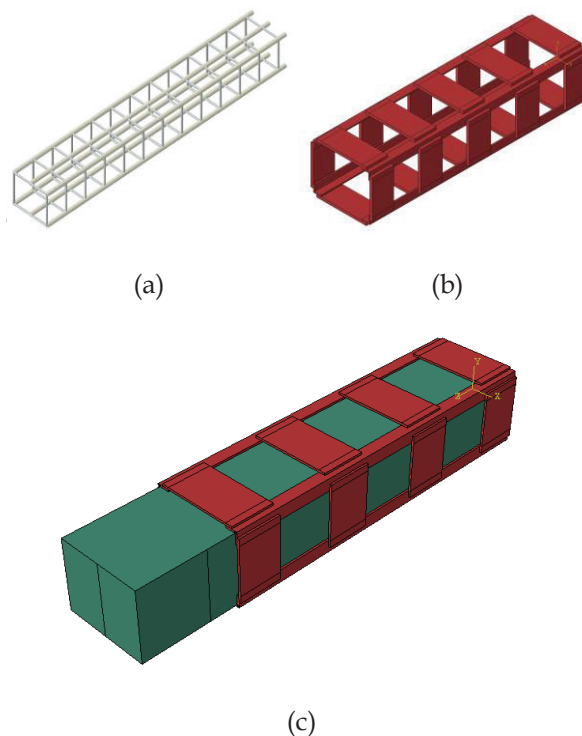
Finite Element Model: (a) Reinforcement Arrangement, (b) Steel Jacket and (c) Whole Model
